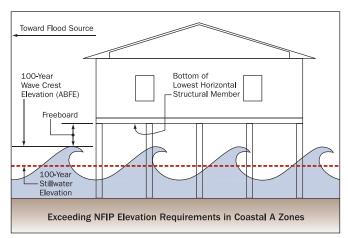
Recommended post-Katrina building standards in Coastal A Zones.
